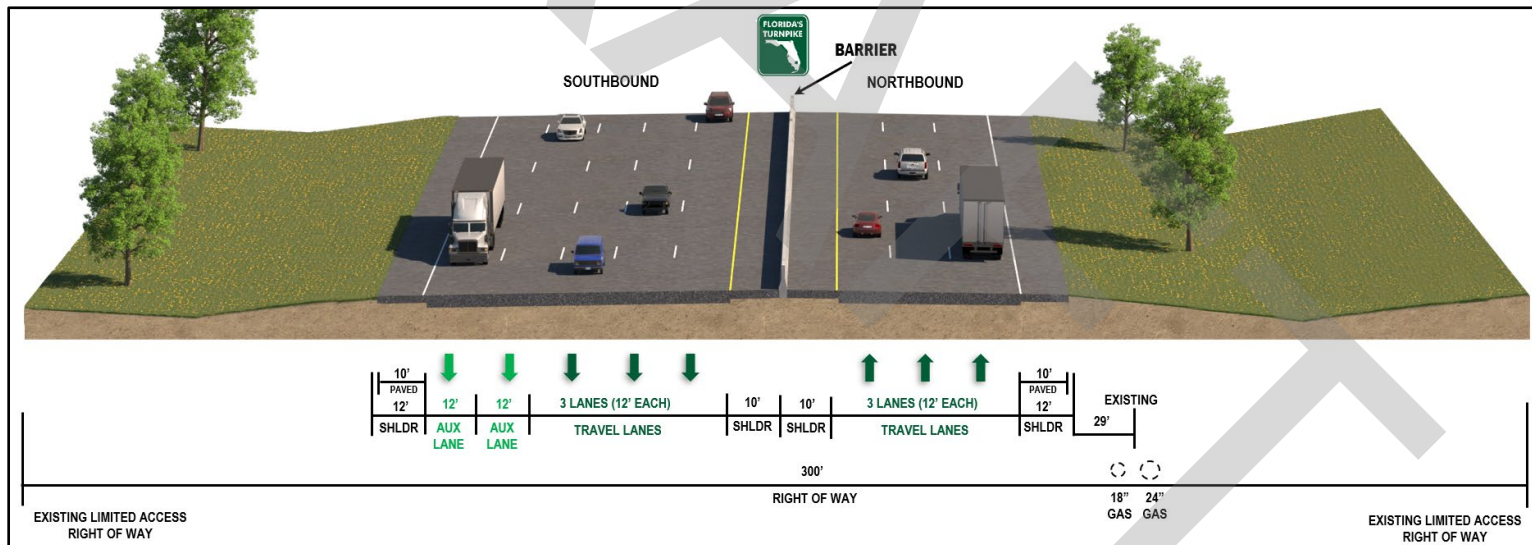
Existing Roadway Section between Sawgrass Expressway and the County Line
